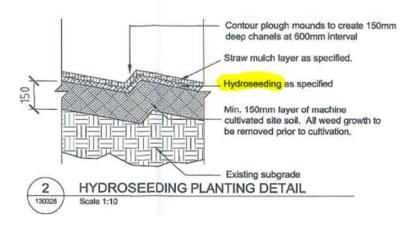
From Endorsed Landscape Plan, Planning Permit P542/02
